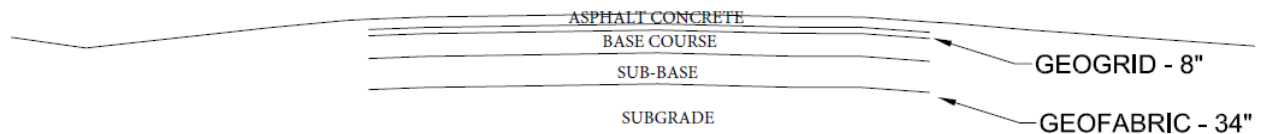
The as-built cross section of the test section FWD4-9. Horizontal scale is equal to vertical scale.
